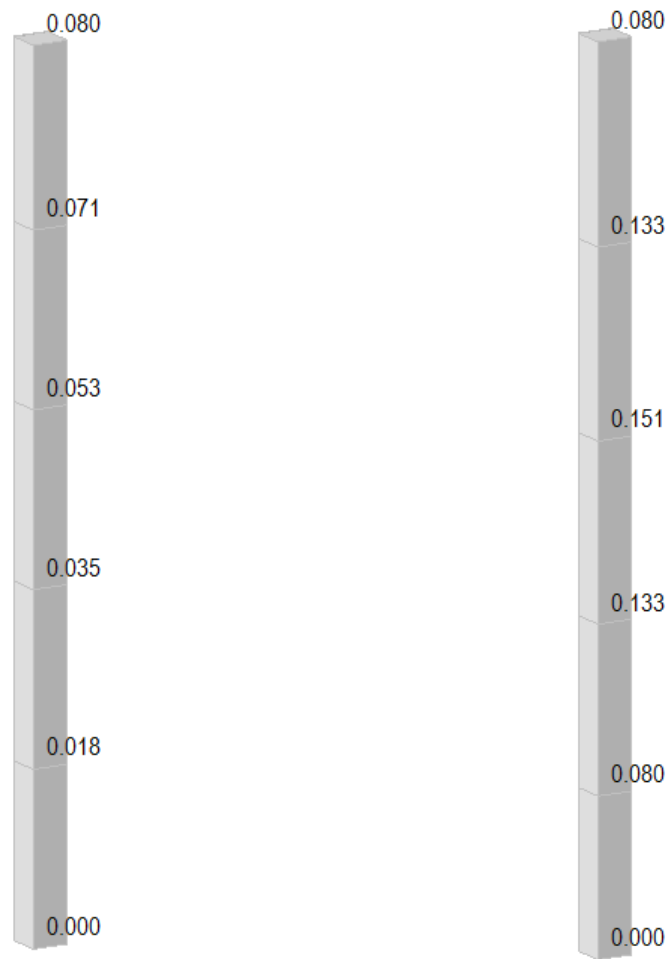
Deformation [mm] of column at first construction step. Dimensions are 1x1x5 meters.
